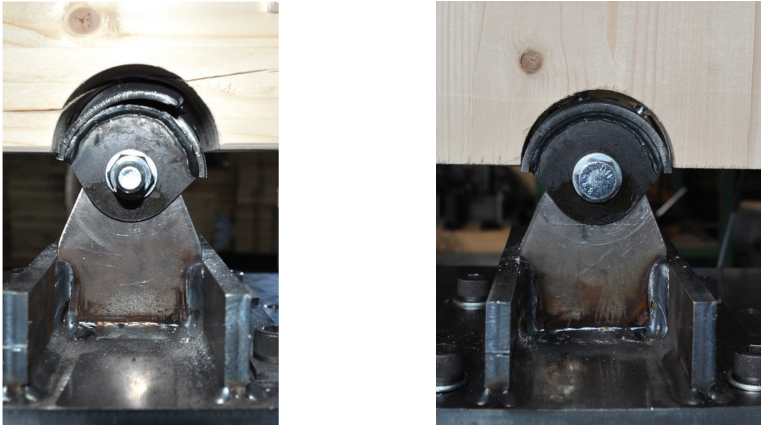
FIT failure modes RADIAL90: steel plate (left) and screws withdrawal failure mode (right)
